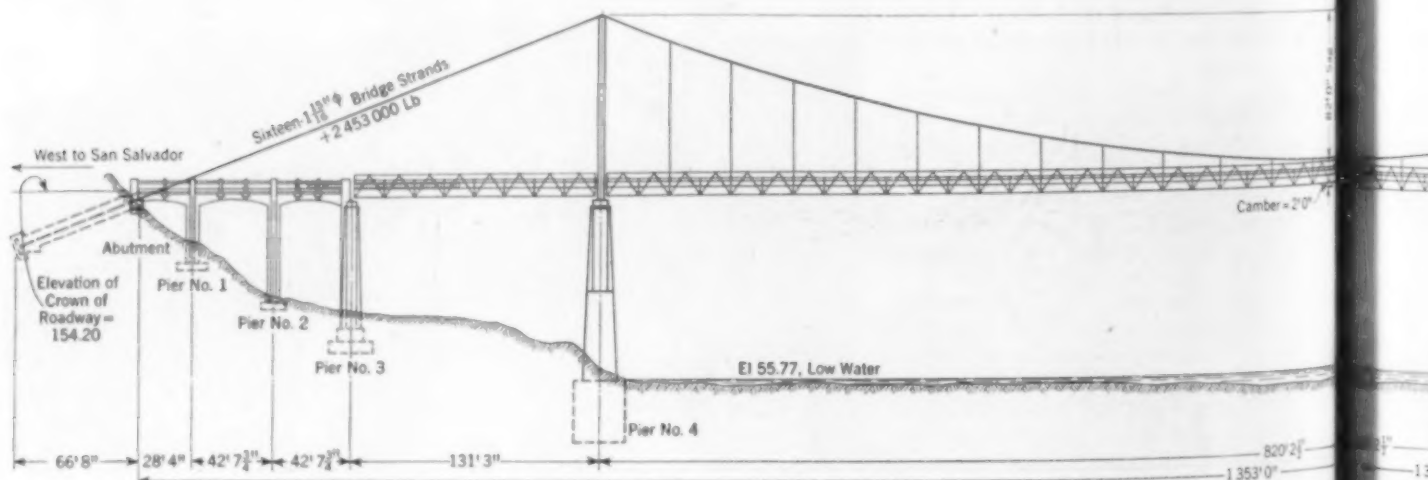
ELEVATION OF CUSCATLAN SUSPENSION BRIDGE
